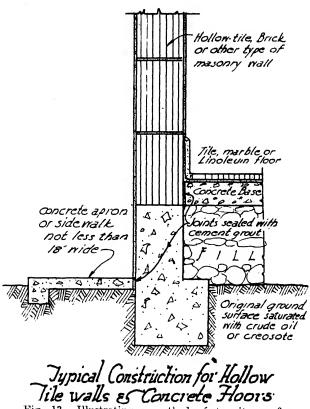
Illustrating a method of termite-proofing a building. (Original.)
